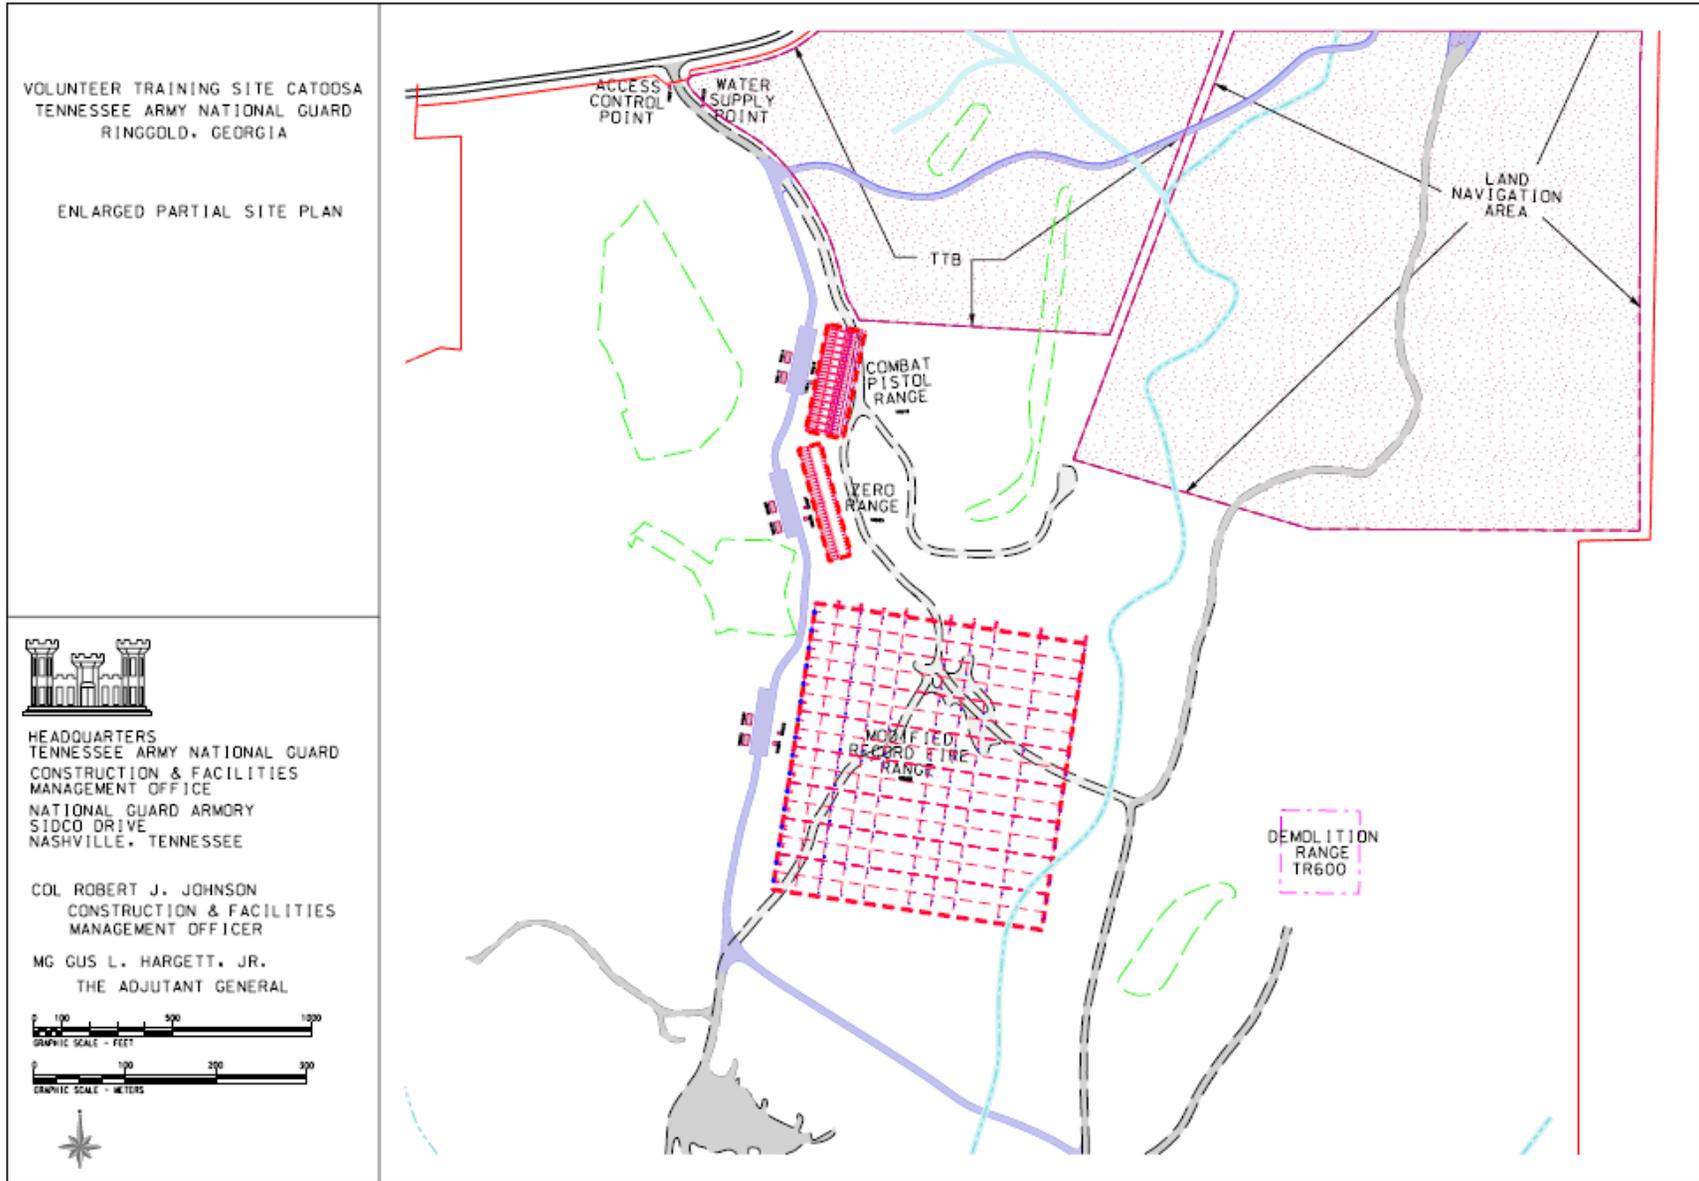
Proposed ranges and associated construction for the VTS-Catoosa. — indicates new road construction.
